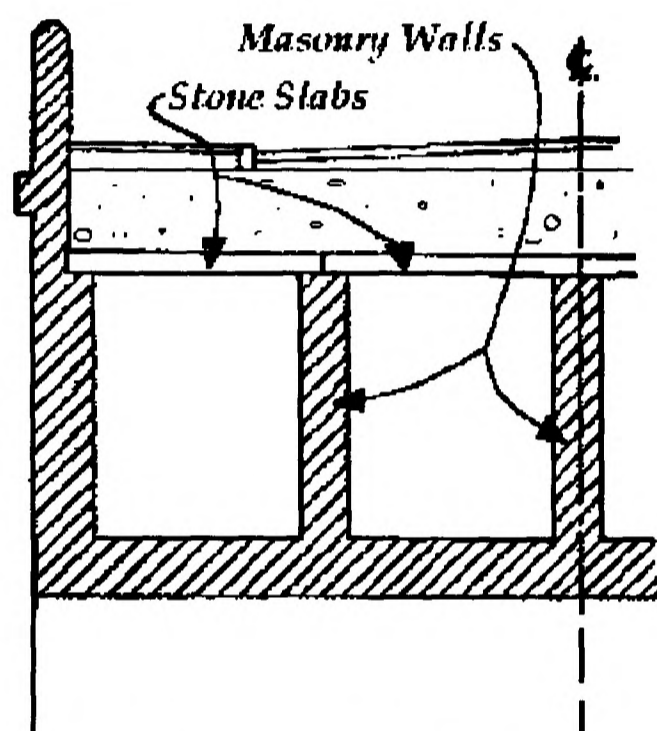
Vertical cross section, through the arch, of bridge with parallel spandrel walls.
